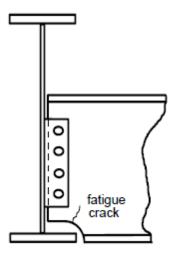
Bottom Flange of Floor Beam Coped at Connection to Girder
